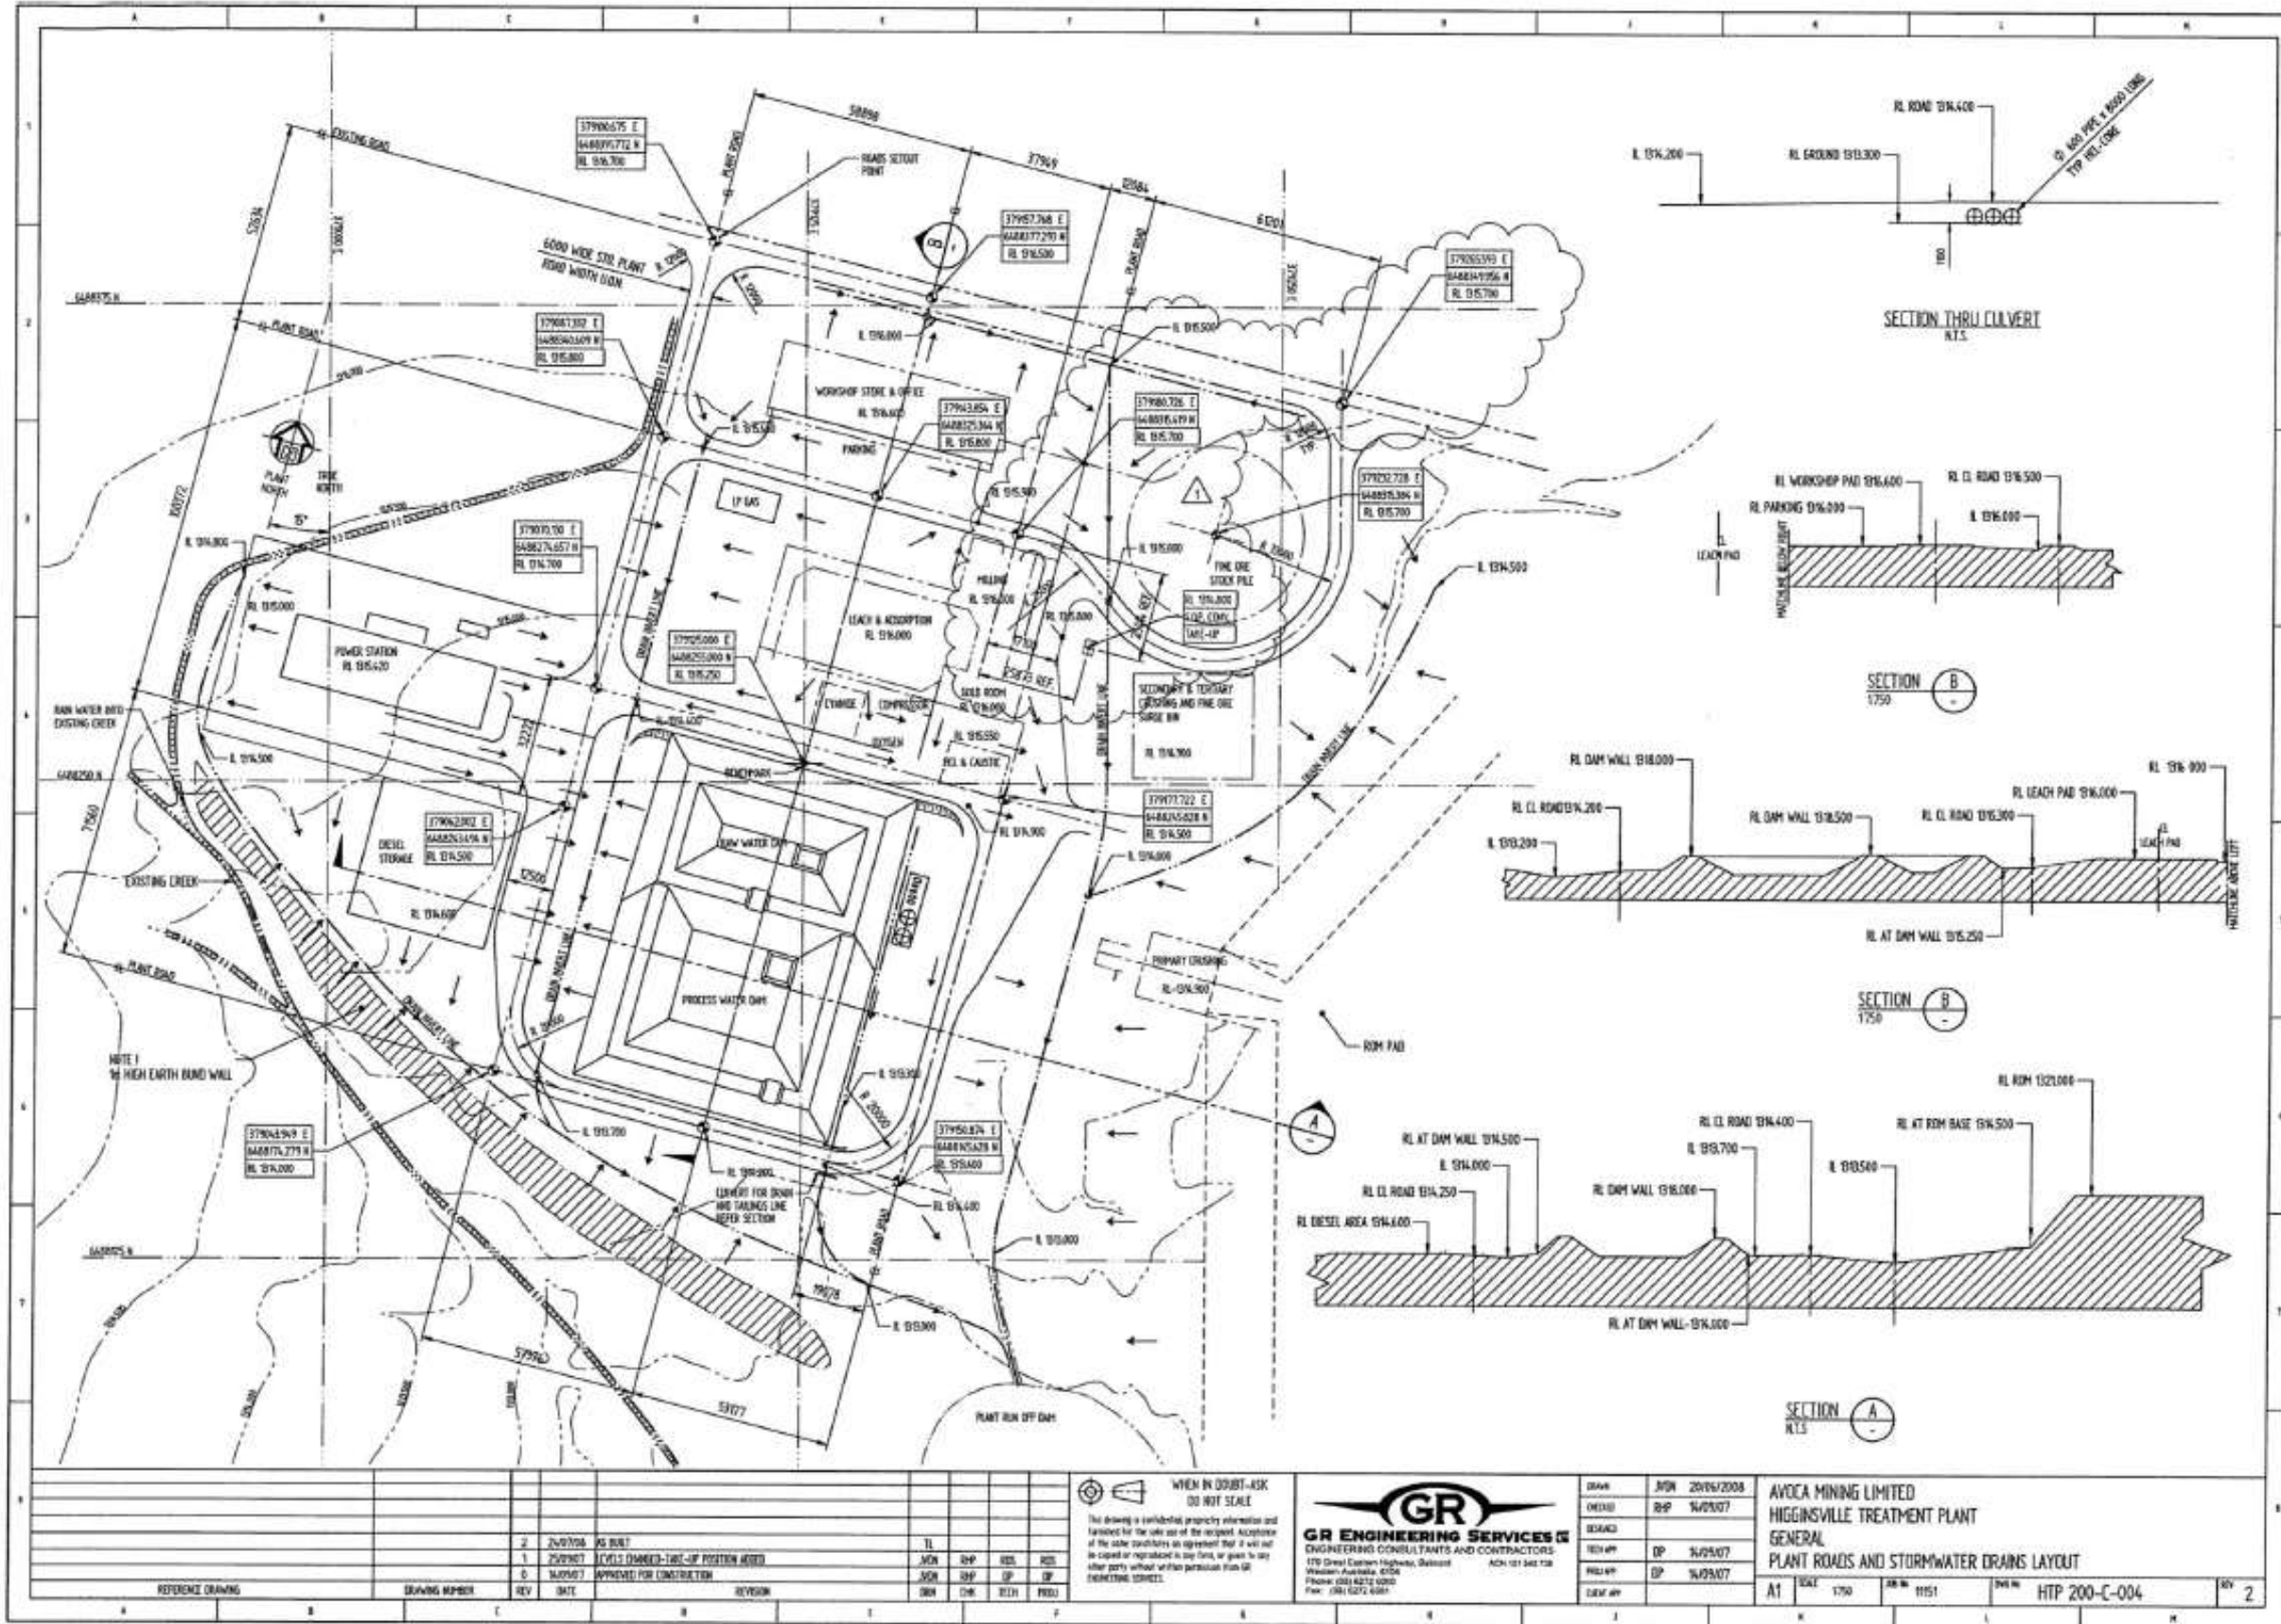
Higginsville Processing Plant Stormwater Management Layout
